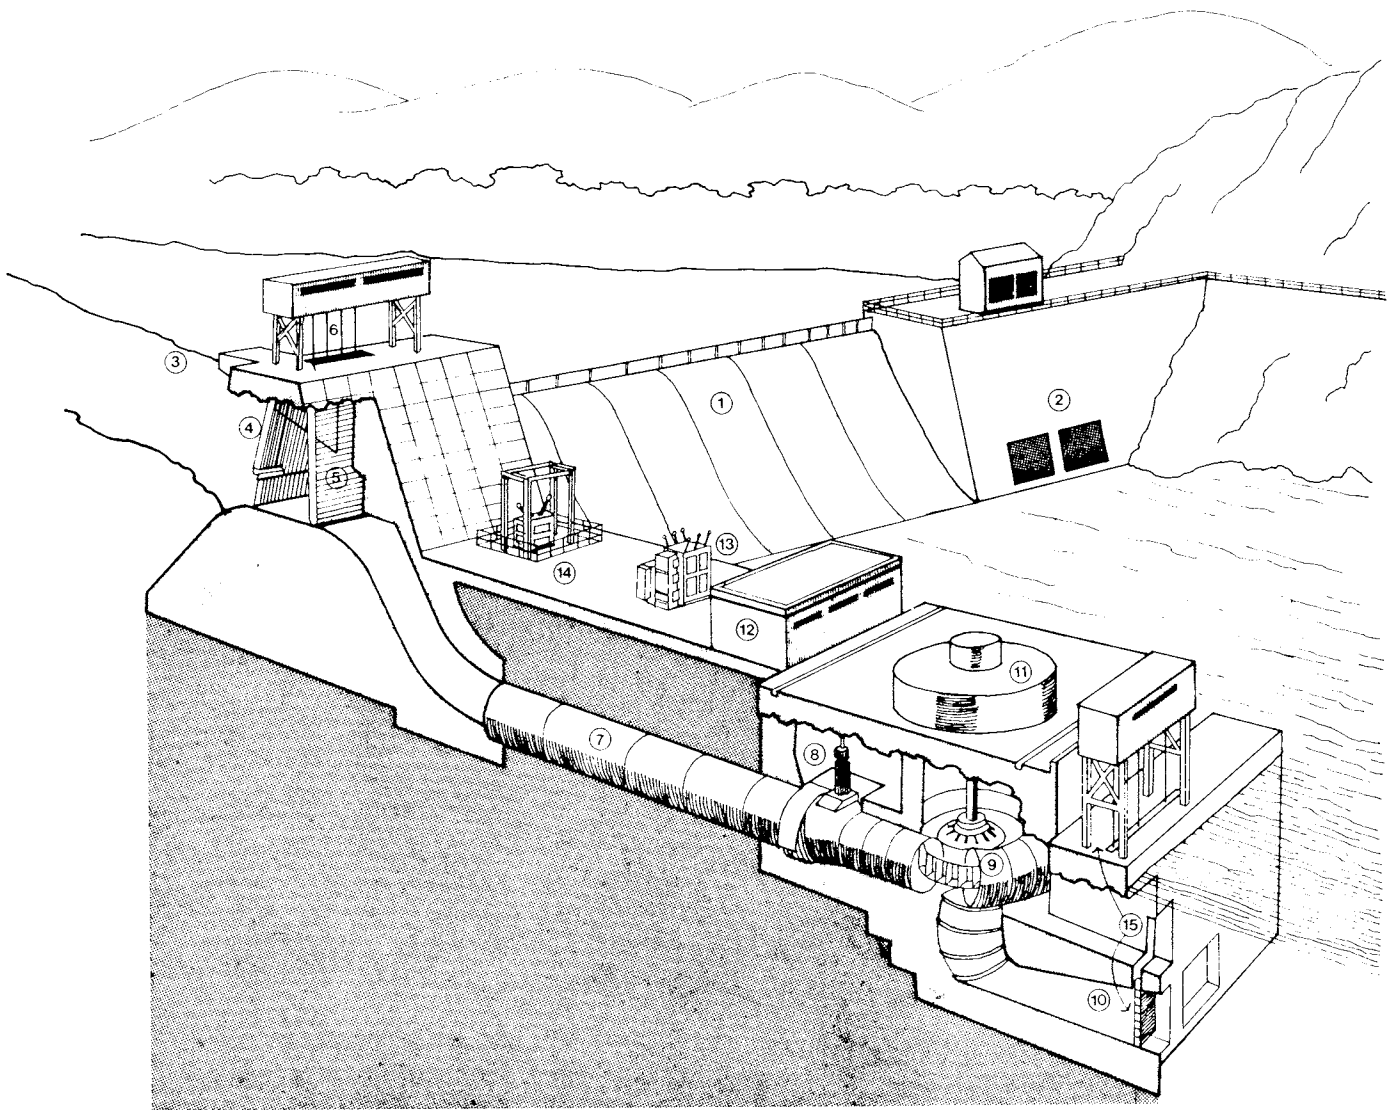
Typical Vermont Hydropower Installation. The walls of the powerhouse and intake structure are removed to illustrate the project works: (1) Dam with flashboards, (2) waste gates and gatehouse, (3) intake forebay, (4) trash racks, (5) intake gate, (6) intake gate hoist, (7) penstock, (8) shut-off valve, (9) turbine, (10) draft tube, (11) generator, (12) switch gear, (13) transformer, (14) circuit breaker, (15) draft tube gate and hoist.
